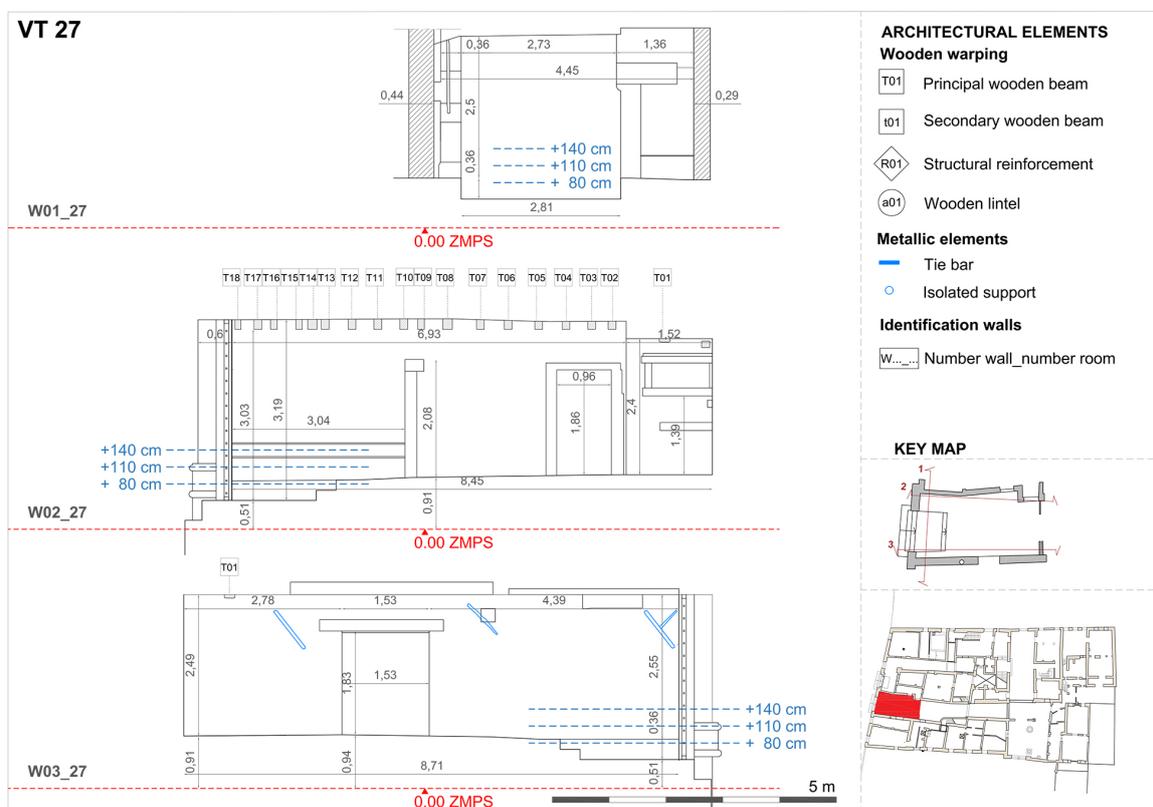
Palazzo Malipiero, Venice. Geometric survey of the walls of a typical room (room 27).
